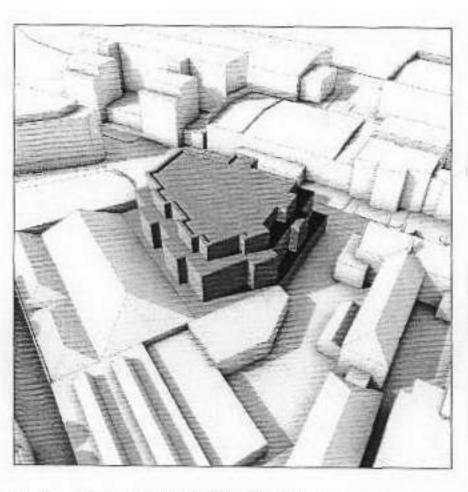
Computer model of 55 Holmes Road following the demolition of the existing plant room.
